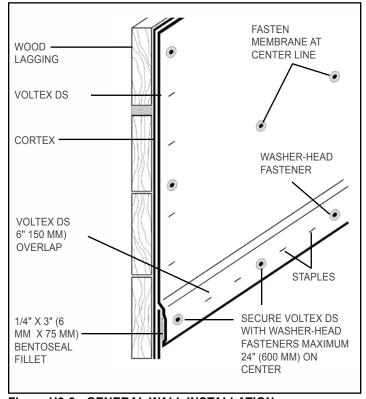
GENERAL WALL INSTALLATION Install Cortex layer onto shoring then install Voltex DS layer directly over Cortex with washer-head fasteners placed maximum 24" (600 cm) on center and staples placed 6" (50 mm) on center.
